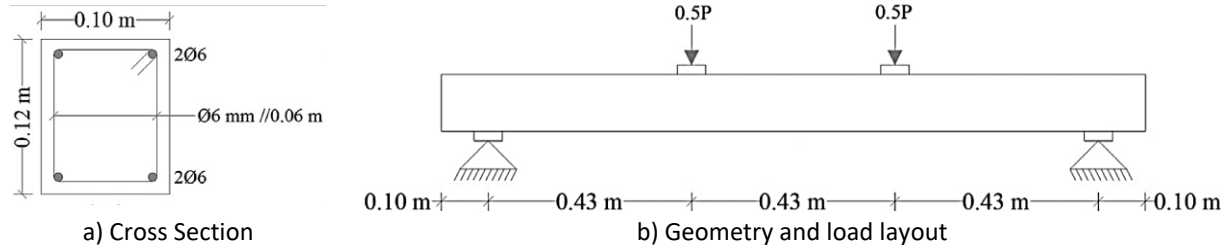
Load layout of the reinforced concrete beam [65, 67].
